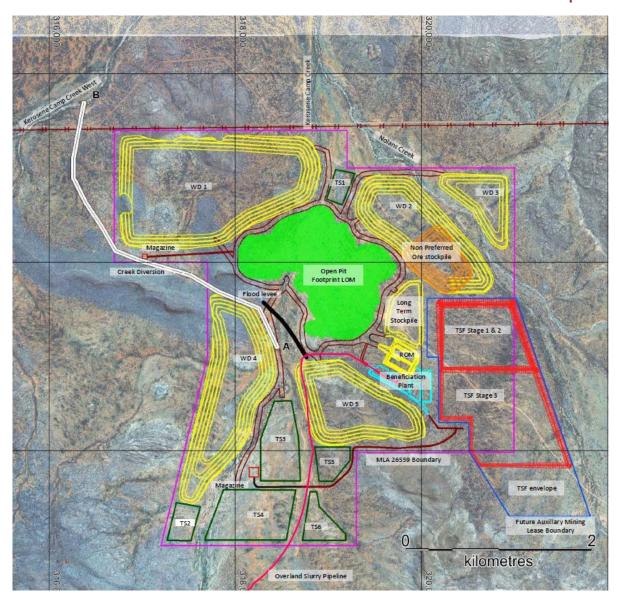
Proposed diversion of Kerosene Camp Creek and mine site layout. Diversion is shown in white. A levee (black) would prevent water ingress to the pit (green). The location of all other infrastructure is indicative only (WD = waste rock dump, ROM = run of mine, TS = topsoil storage). Source: supplied by Proponent.
